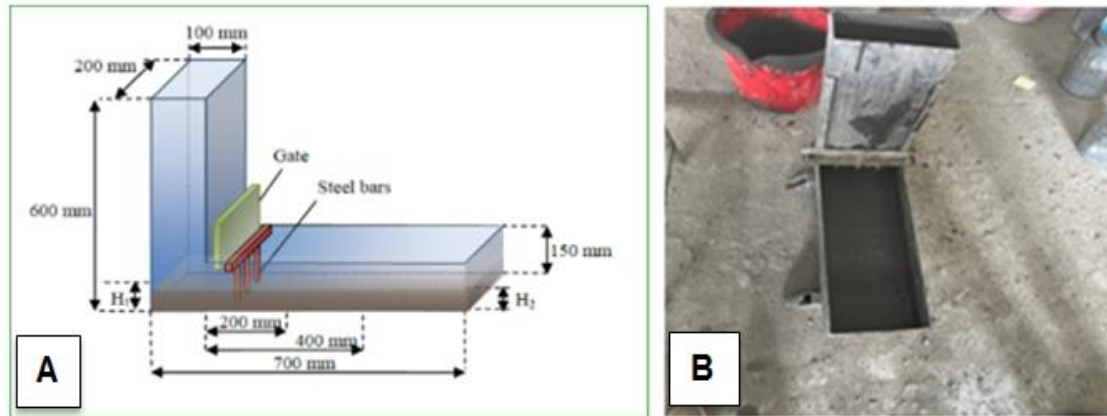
L-Box test equipment. [A] Dimensions of the steel mold used, [B] its shape in checking the test L-Box.
